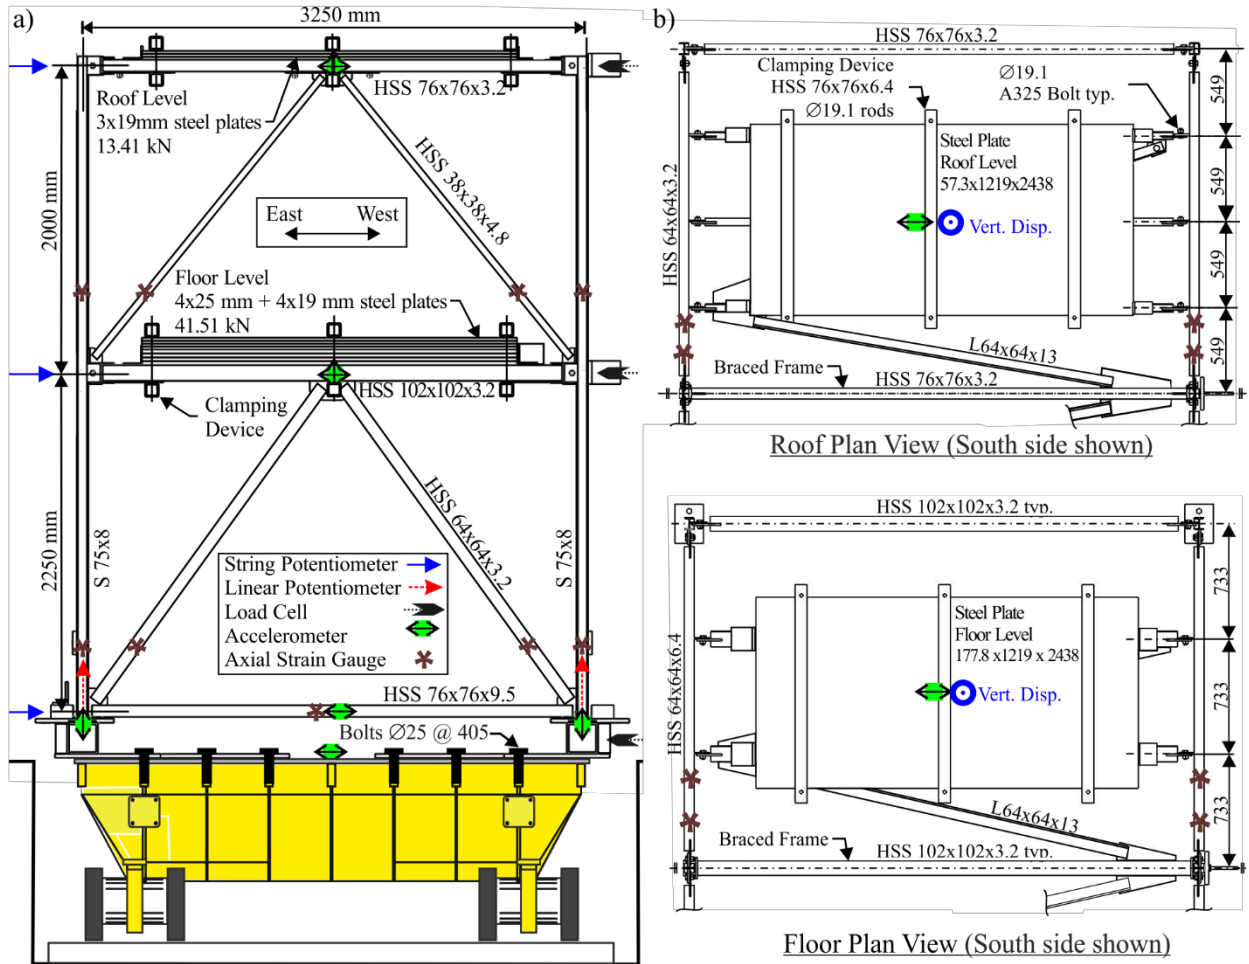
Rocking brace frame specimen with construction and instrumentation details: a) Rocking frame elevation (from North); b) Half plan views of the floor and roof structures
